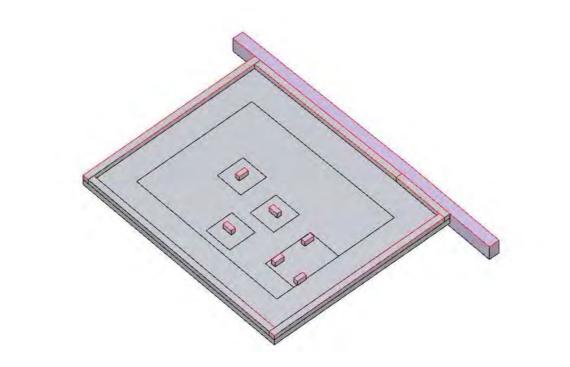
Basement level retaining wall boot construction and wall stem kicker shown adjacent to underpinned boundary wall
